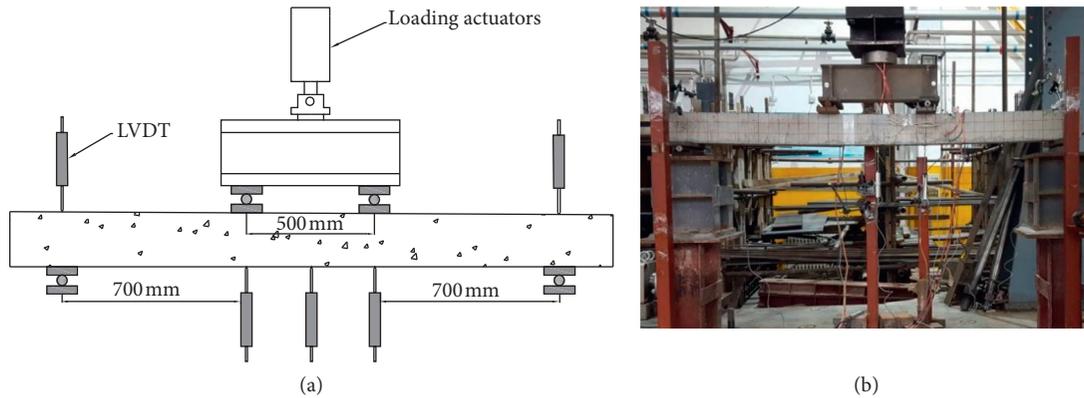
Schematic of the fatigue loading test setup. (a) Sketch of loading test equipment. (b) Loading test equipment.
